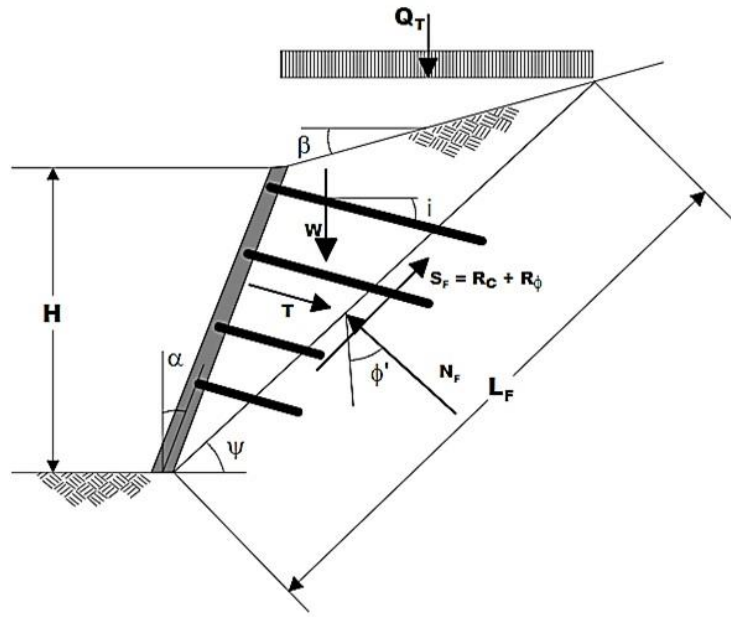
Failure mechanism of soil nailed wall in single-wedge failure (Lazarte et al. 2003)
